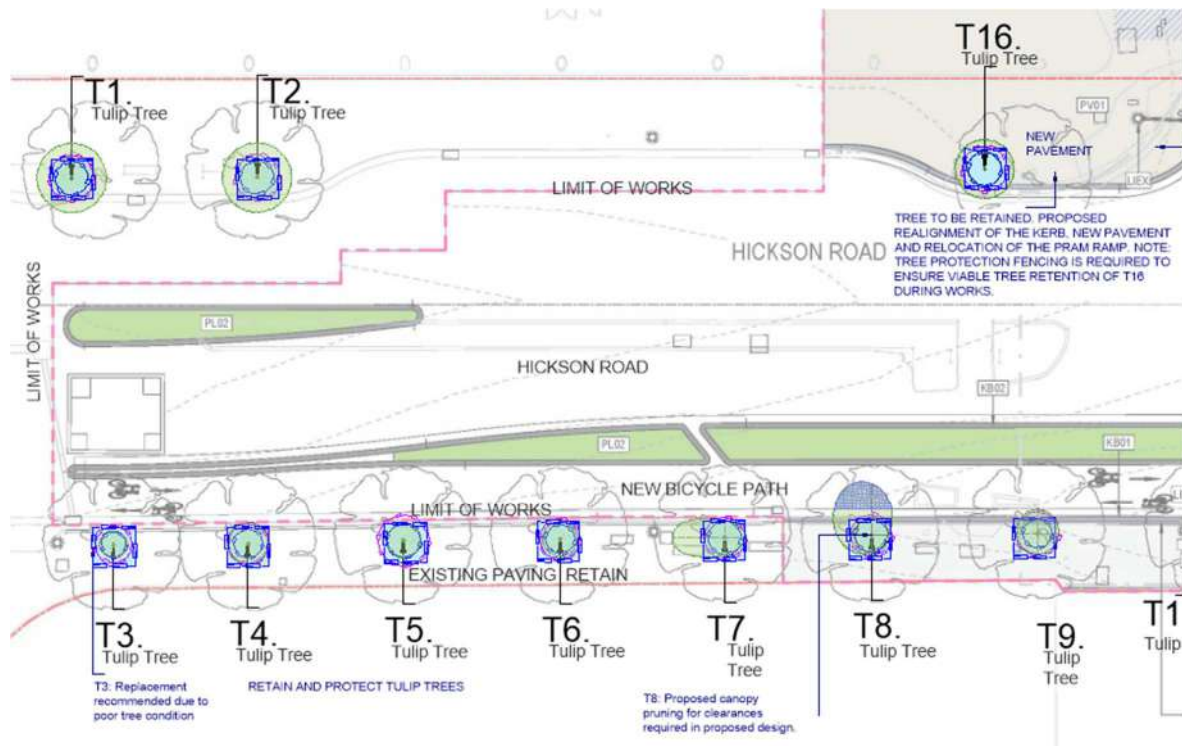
A portion of the proposal plan with the Arborist Impact Plan over and survey below showing the southern portion of the site. In particular: no new paving is proposed around T1 to T9. Canopy pruning is proposed for T8. Whilst T3 is proposed to be replaced due to poor condition, this is to the discretion/action of council as it is outside the scope area (denoted with a light red dashed line).
